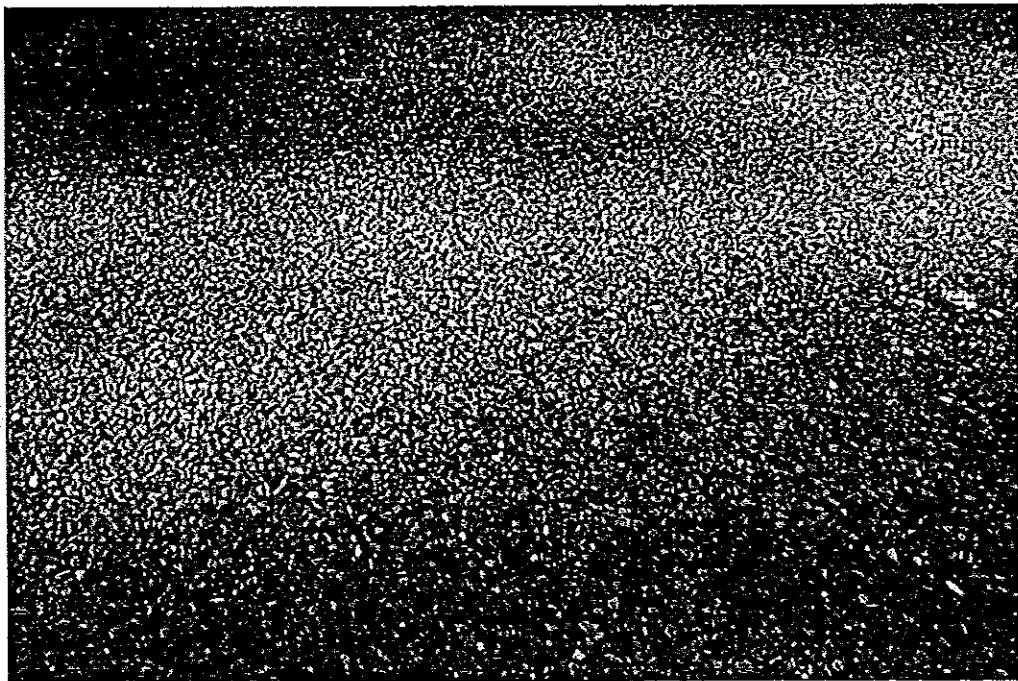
I-495 NB Typical Surface Texture (6-800 ft)
